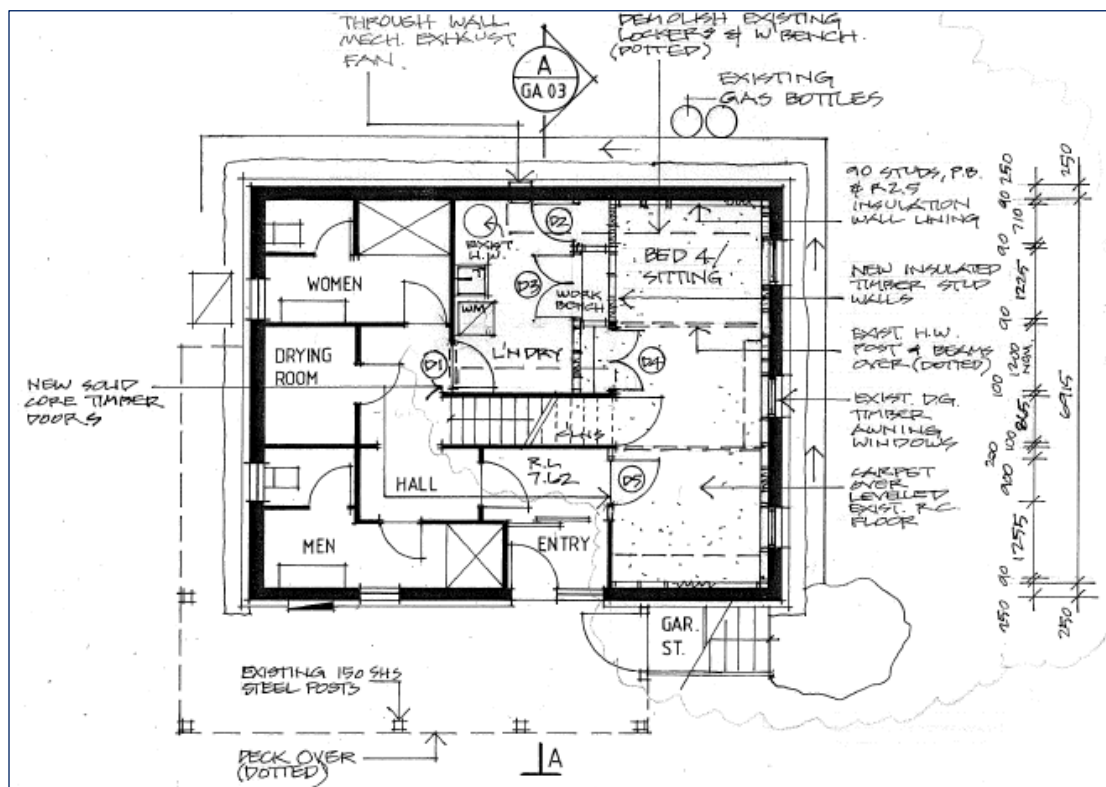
| Proposed alterations to the ground floor locker room (Source: Applicant's documentation)
